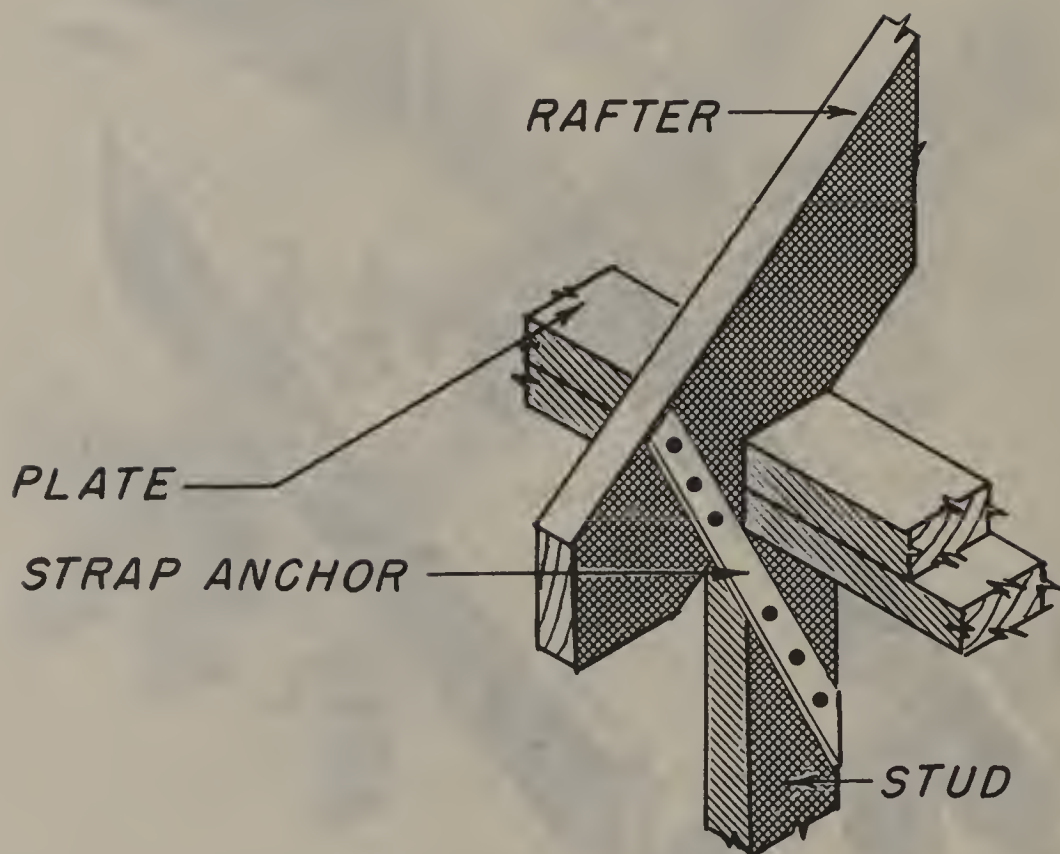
Straps to resist uplift on notched rafters. Straps placed on opposite sides and as nearly vertical as possible, nailed to each framing member with three eightpenny nails. Straps to be in addition to nailing specified in figure 44 in order to get greater security against uplift.
